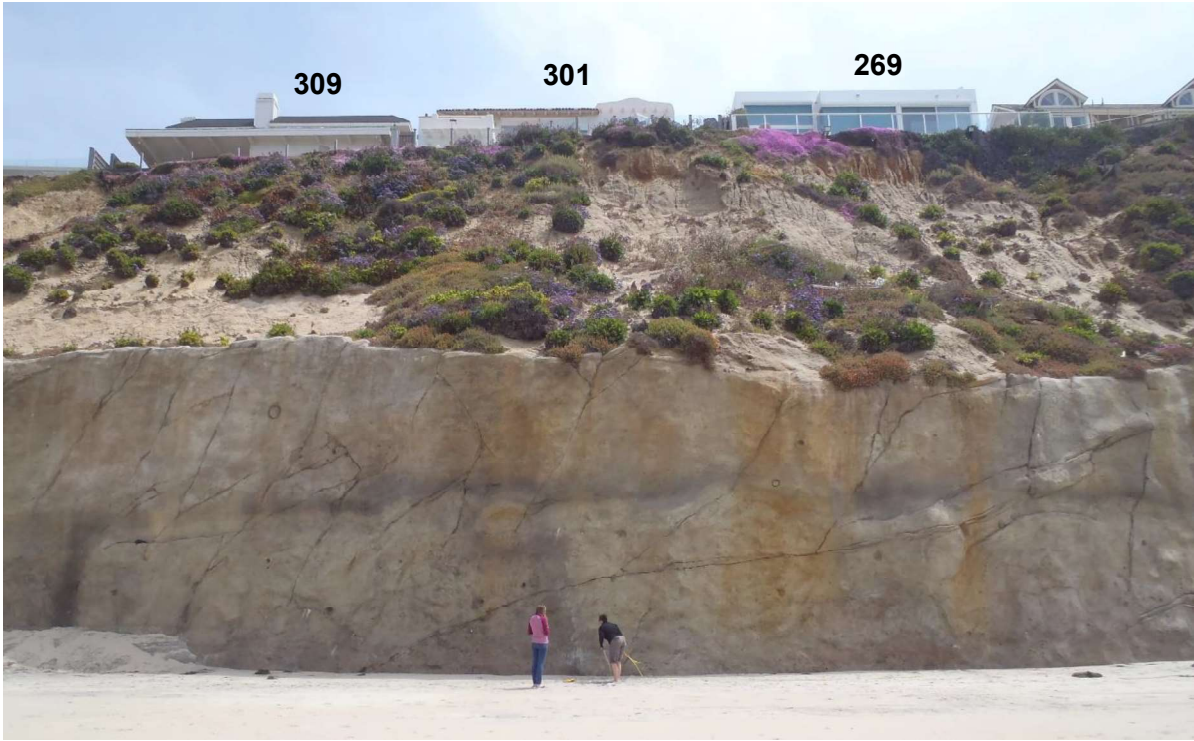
Seawall below 309 to 269 Pacific Avenue (April 26, 2023).
